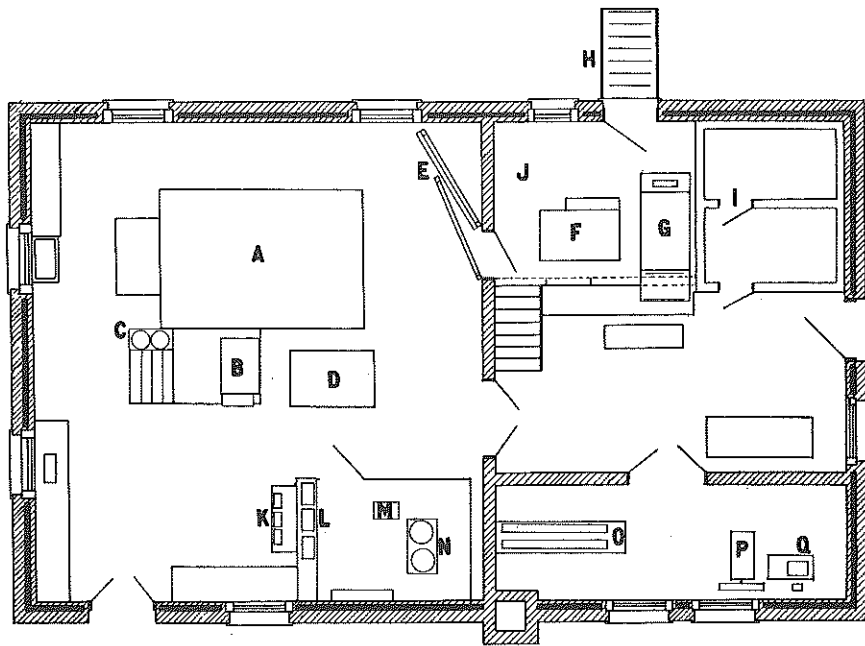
GROUND PLAN OF RESPIRATION CALORIMETER BUILDING
